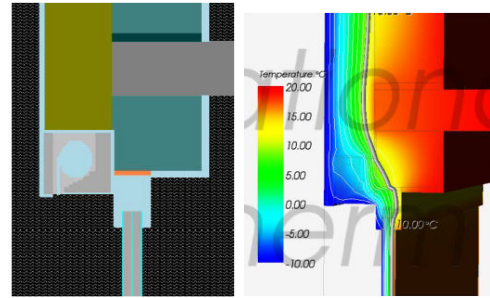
Wall/Window connection detail of system B (IS_01_b)
